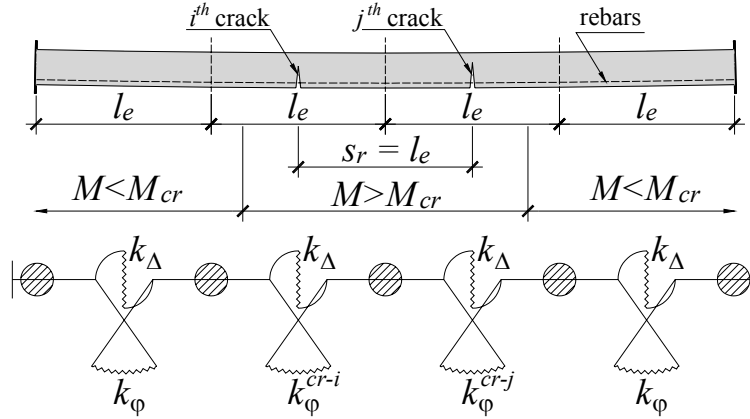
Scheme and numerical model of the reinforced concrete beam with cracks
